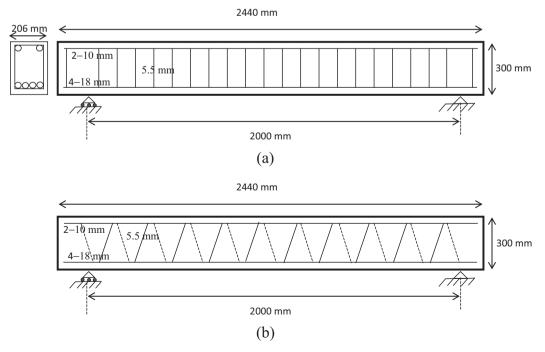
(a) Beam details using single stirrups; (b) Beam details using rectangular spiral reinforcement.
